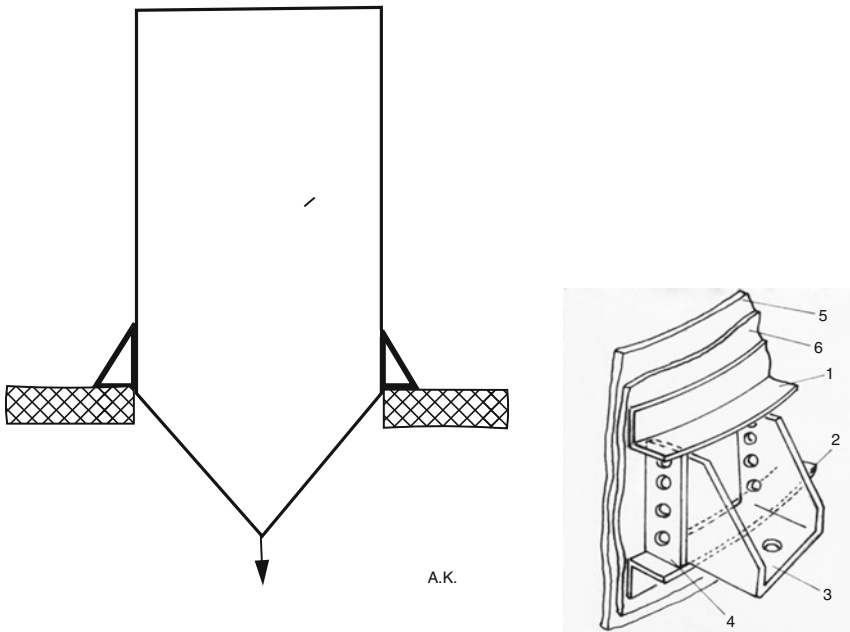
Supporting equipment, tanks, and silos requiring free space beneath. A.K.: (1) upper ring-shaped steel; (2) lower ring-shaped steel; (3) bucket (U profile); (4) side-steel supporter; (5) apparatus stainless steel wall; (6) intermediate stainless steel plate
